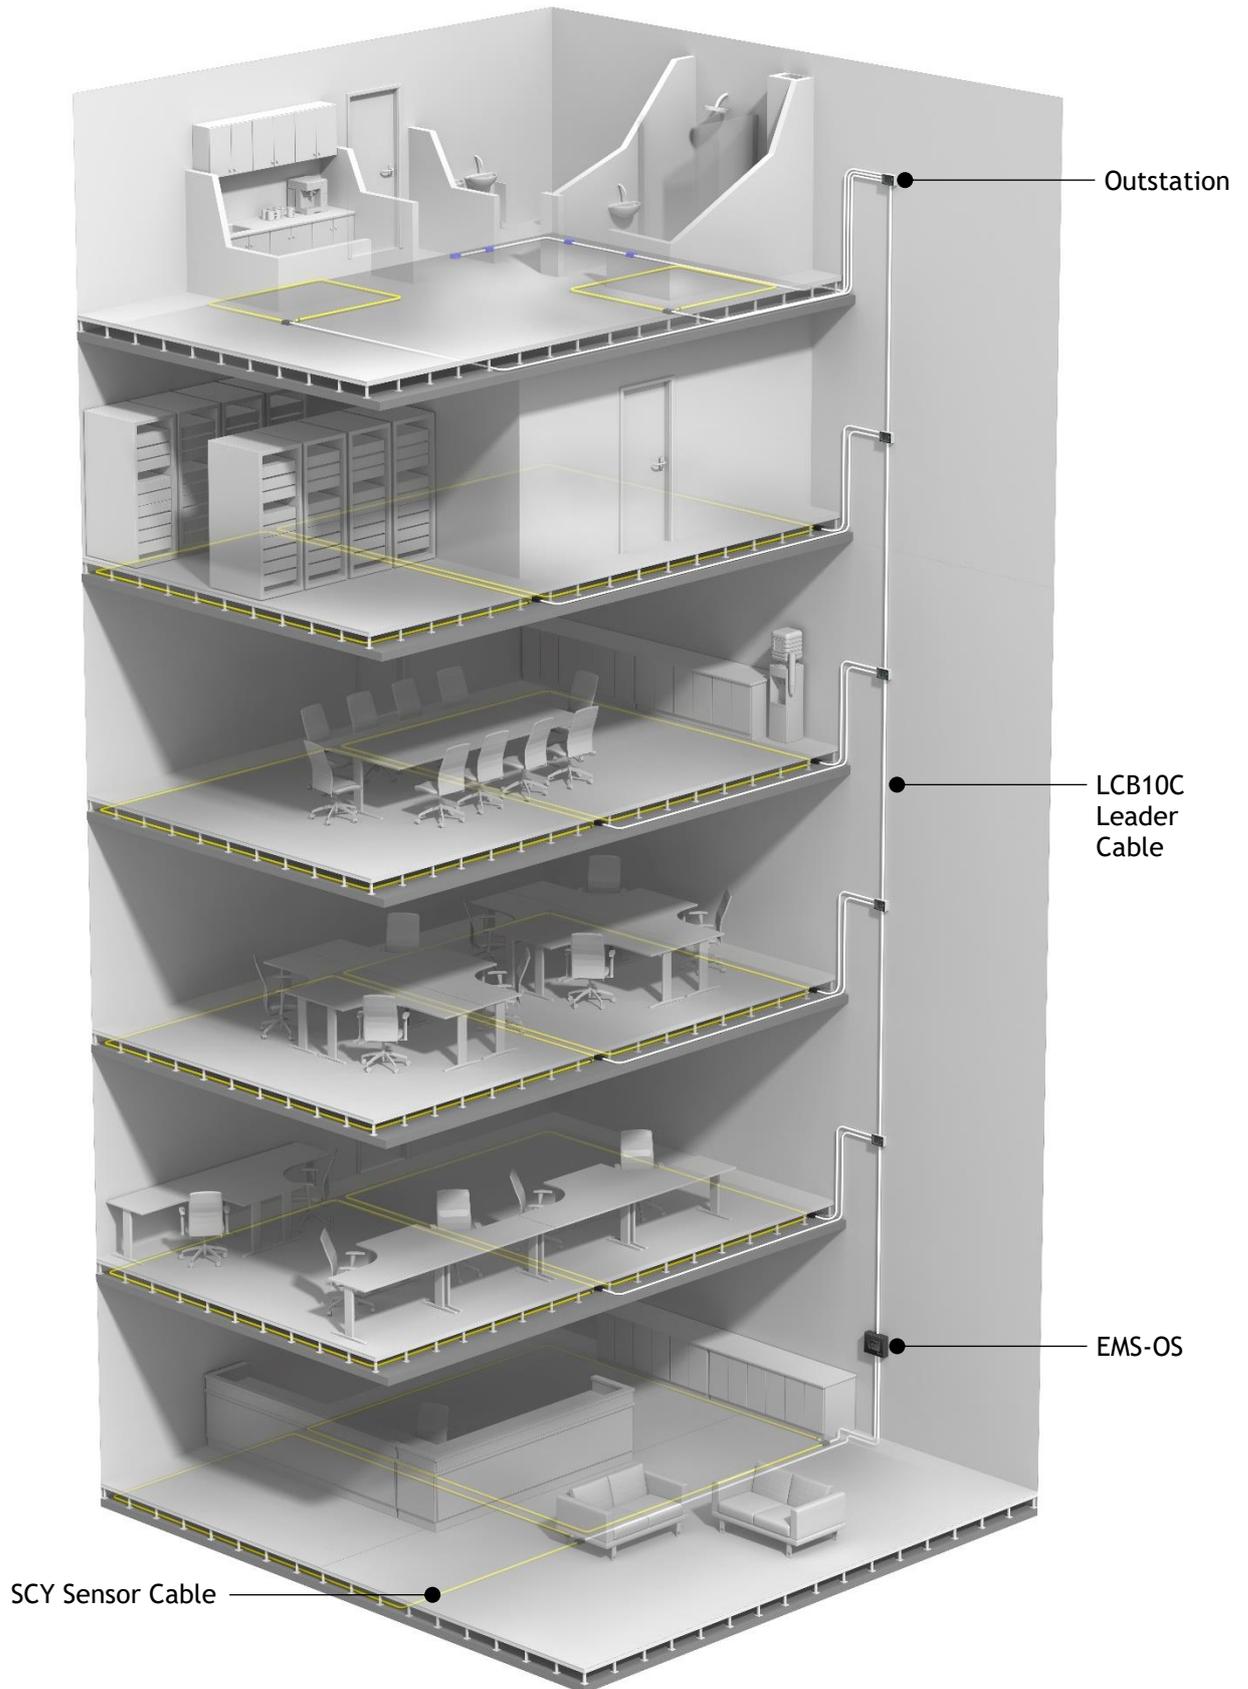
EMS-OS Multiple Zone / Floor Example Using Outstations
